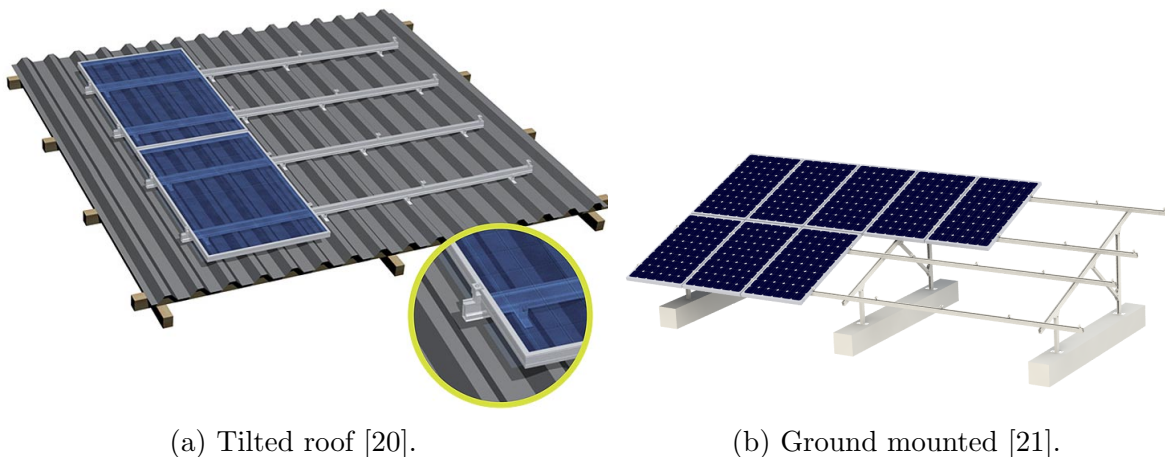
Mounting system for (a) tilted wave corrugated roof and (b) ground mounted with concrete piles.
